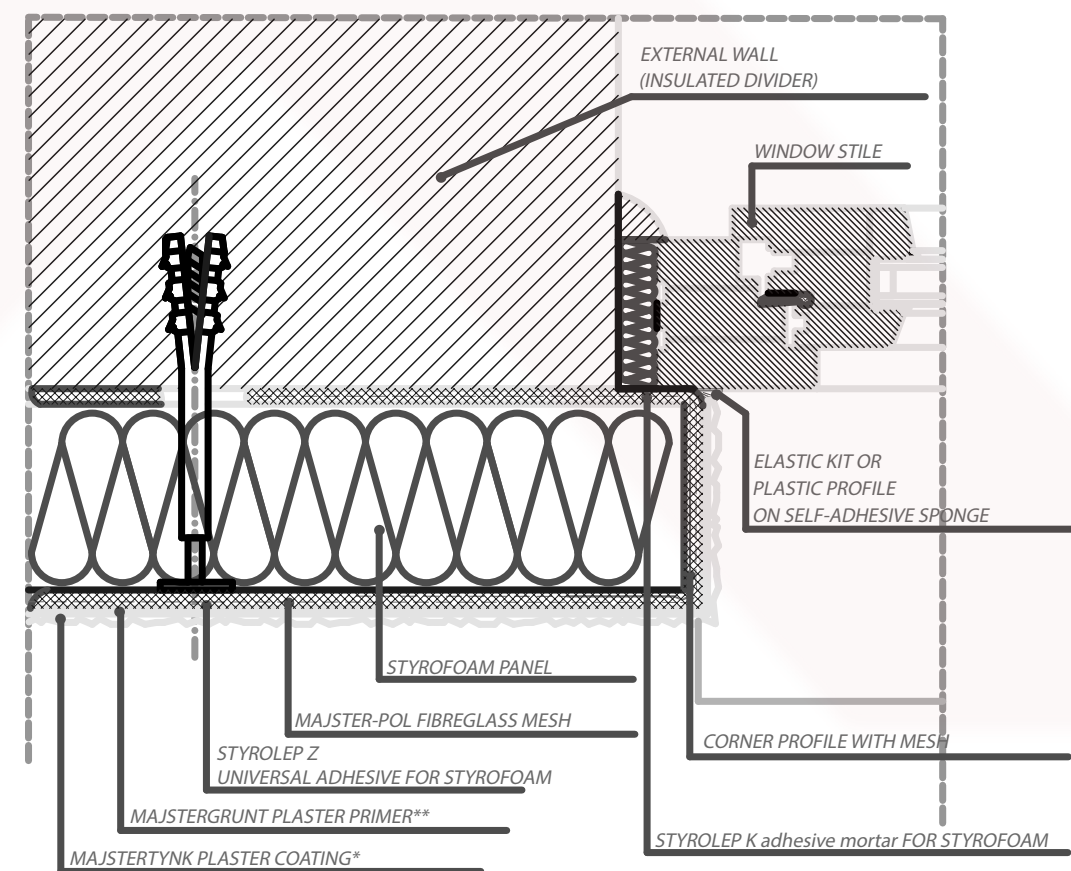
Closeup of thermal insulation of the divider by the window compatible with the insulated wall. (horizontal cross-section)
